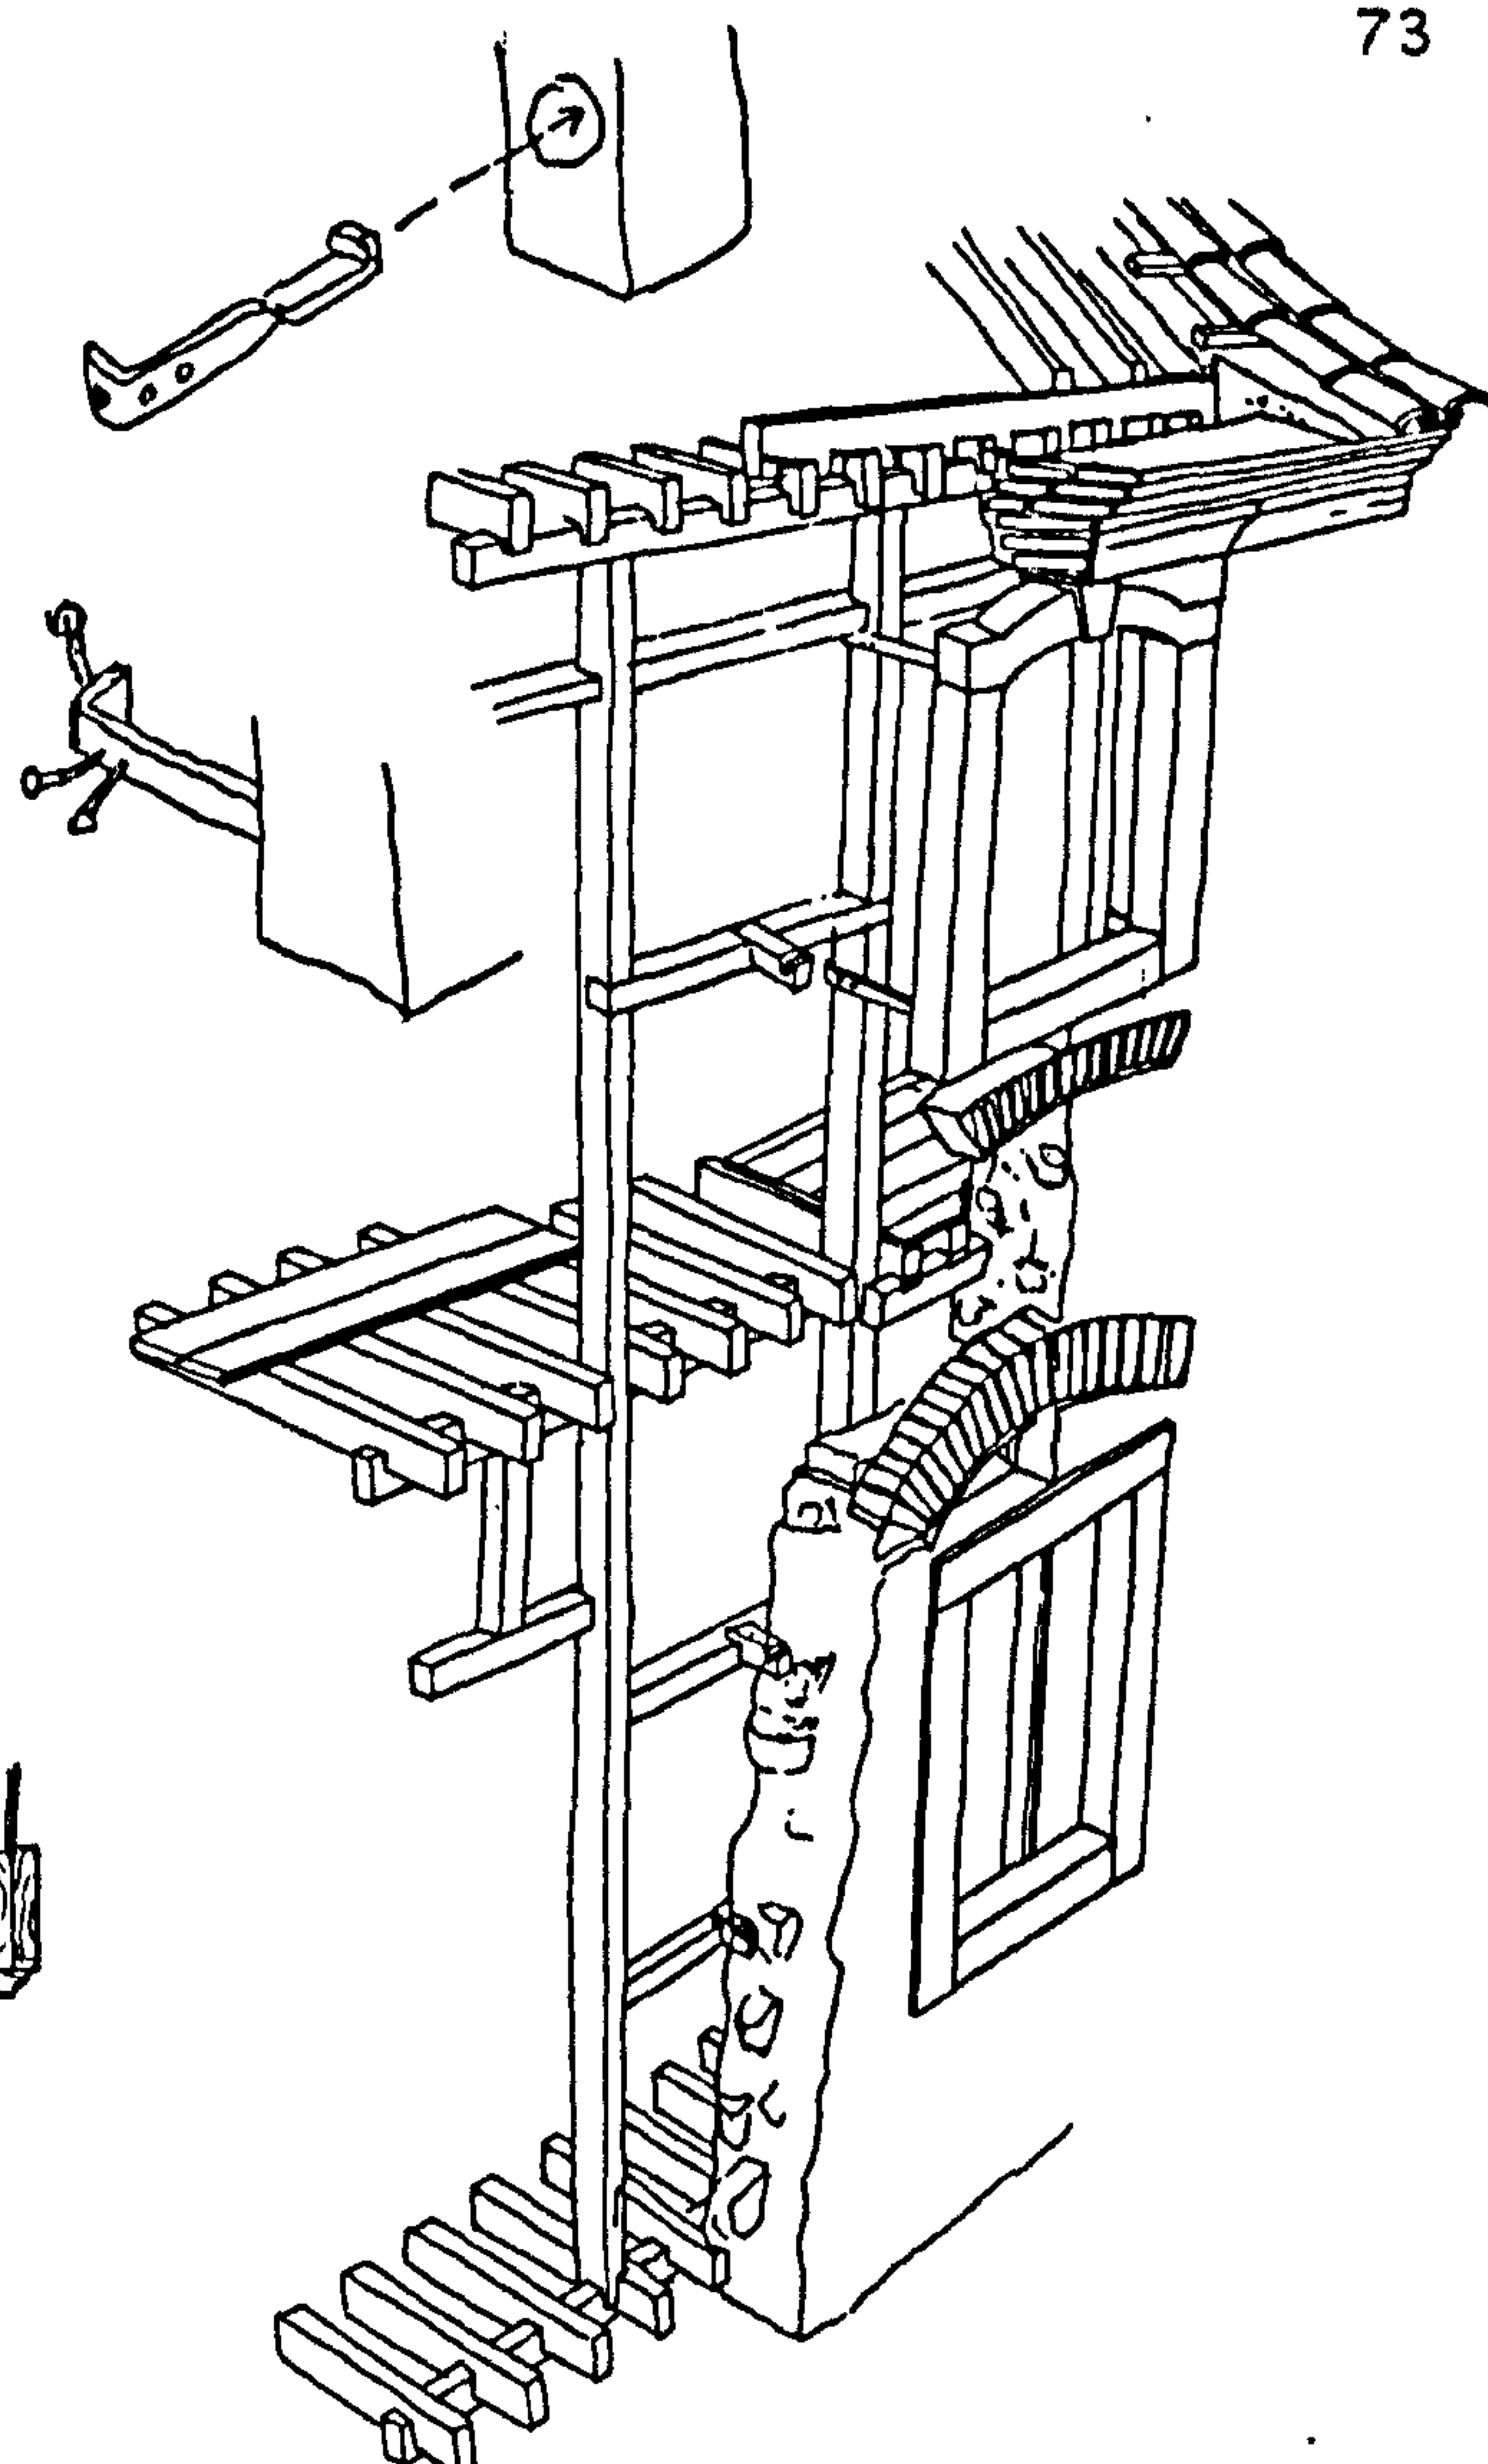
Fixing of stone window jambs and rubble stonework to the *gaiola* (buildings I and P)
